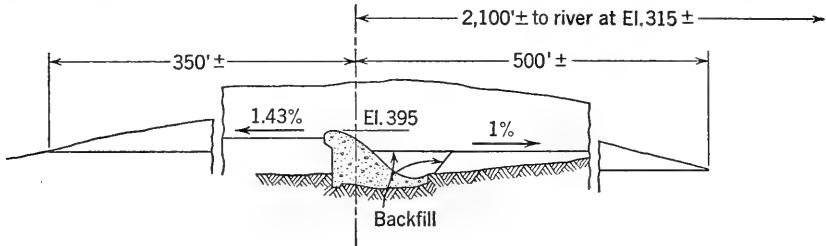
Saddle spillway, Wappapello Dam. Foundation is hard, blocky limestone. Infrequent operation.
